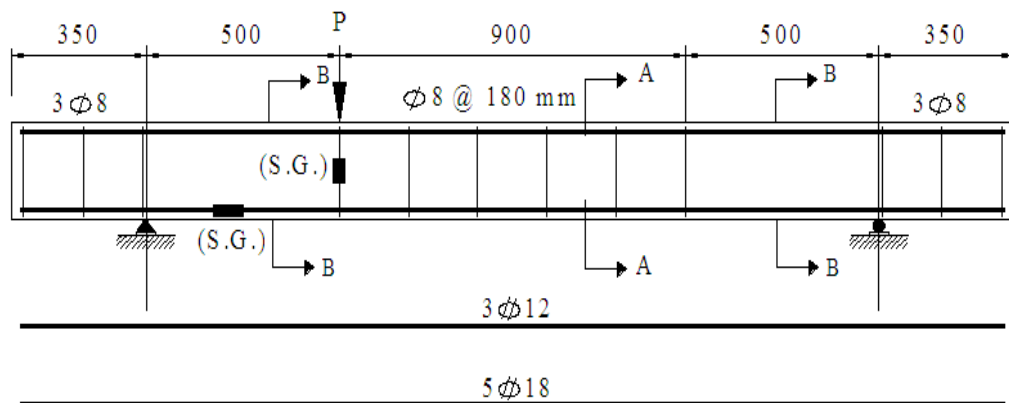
Test set up, Details of Reinforcement, and Strain Gauge for Tested Beams
